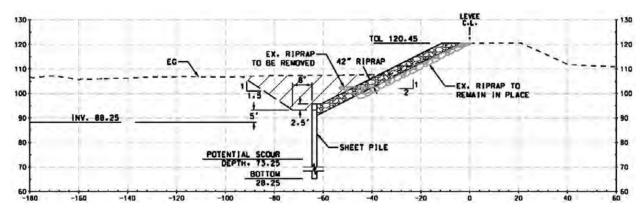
Typical Cross Section of Alternative B2 (Sta. 368+00)
